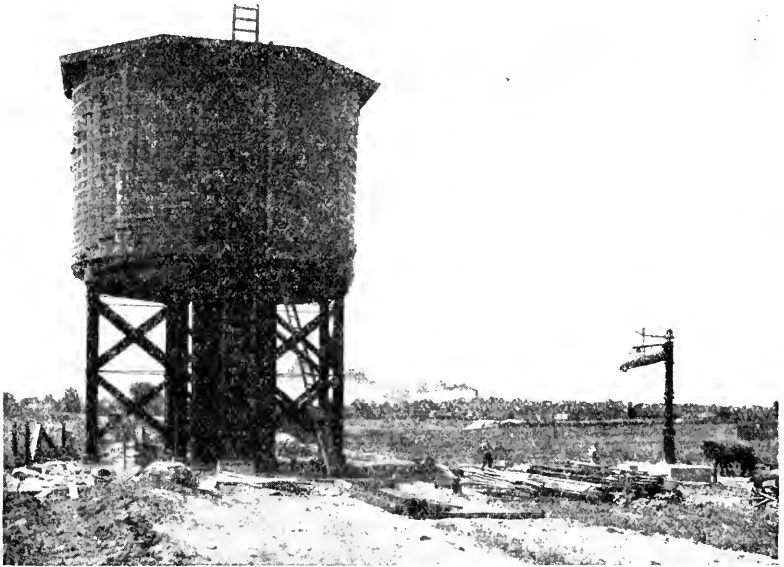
WATER COLUMN, ILLINOIS CENTRAL RAILROAD, CLINTON, ILL.
